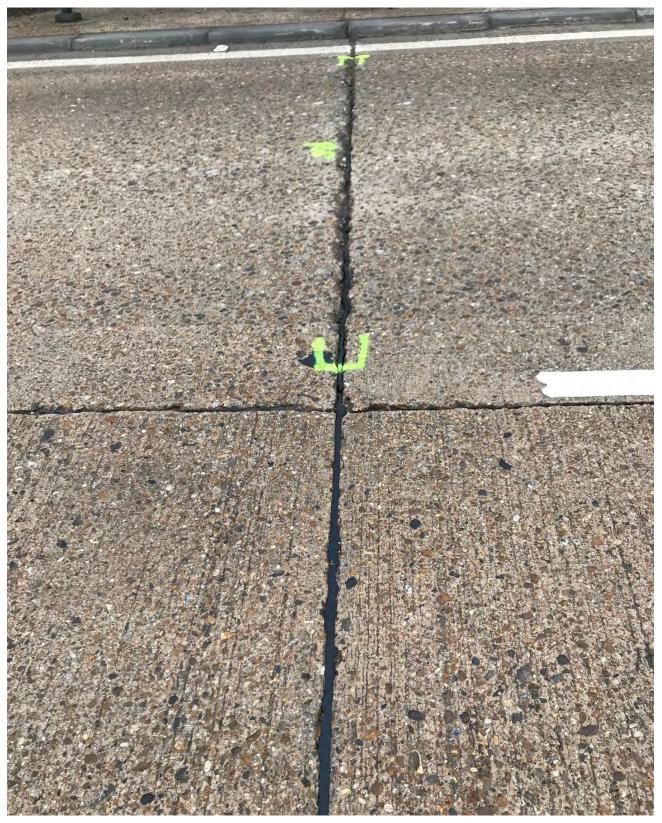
Joint groove in furthest lane damaged by retexturing requiring a thin bonded repair. Closest lane joint groove not subject to retexturing in good condition
